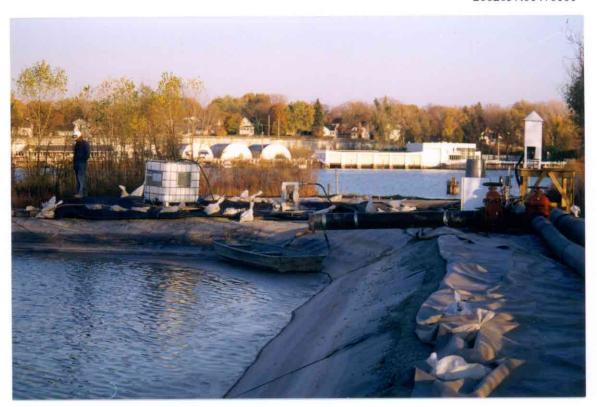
Dredge slurry sampling station at southeast corner of east equalization basin. Note valves on slurry pipe.
